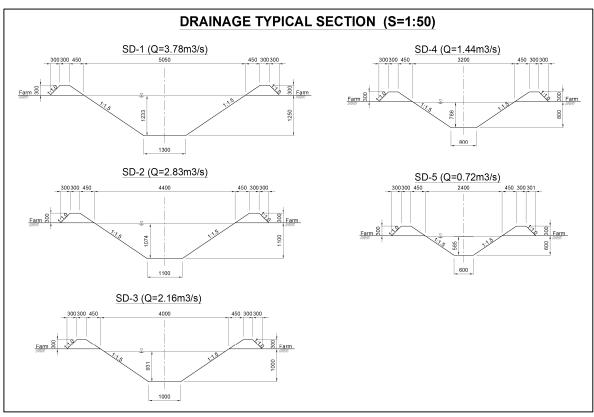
Typical Cross section of Drainage in Command Area
